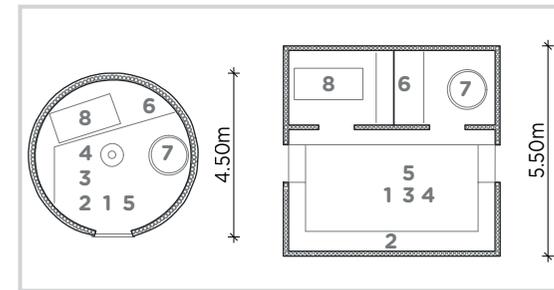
Floor plans of a traditional “Sar bet” and “Corcoro” house M 1:200
